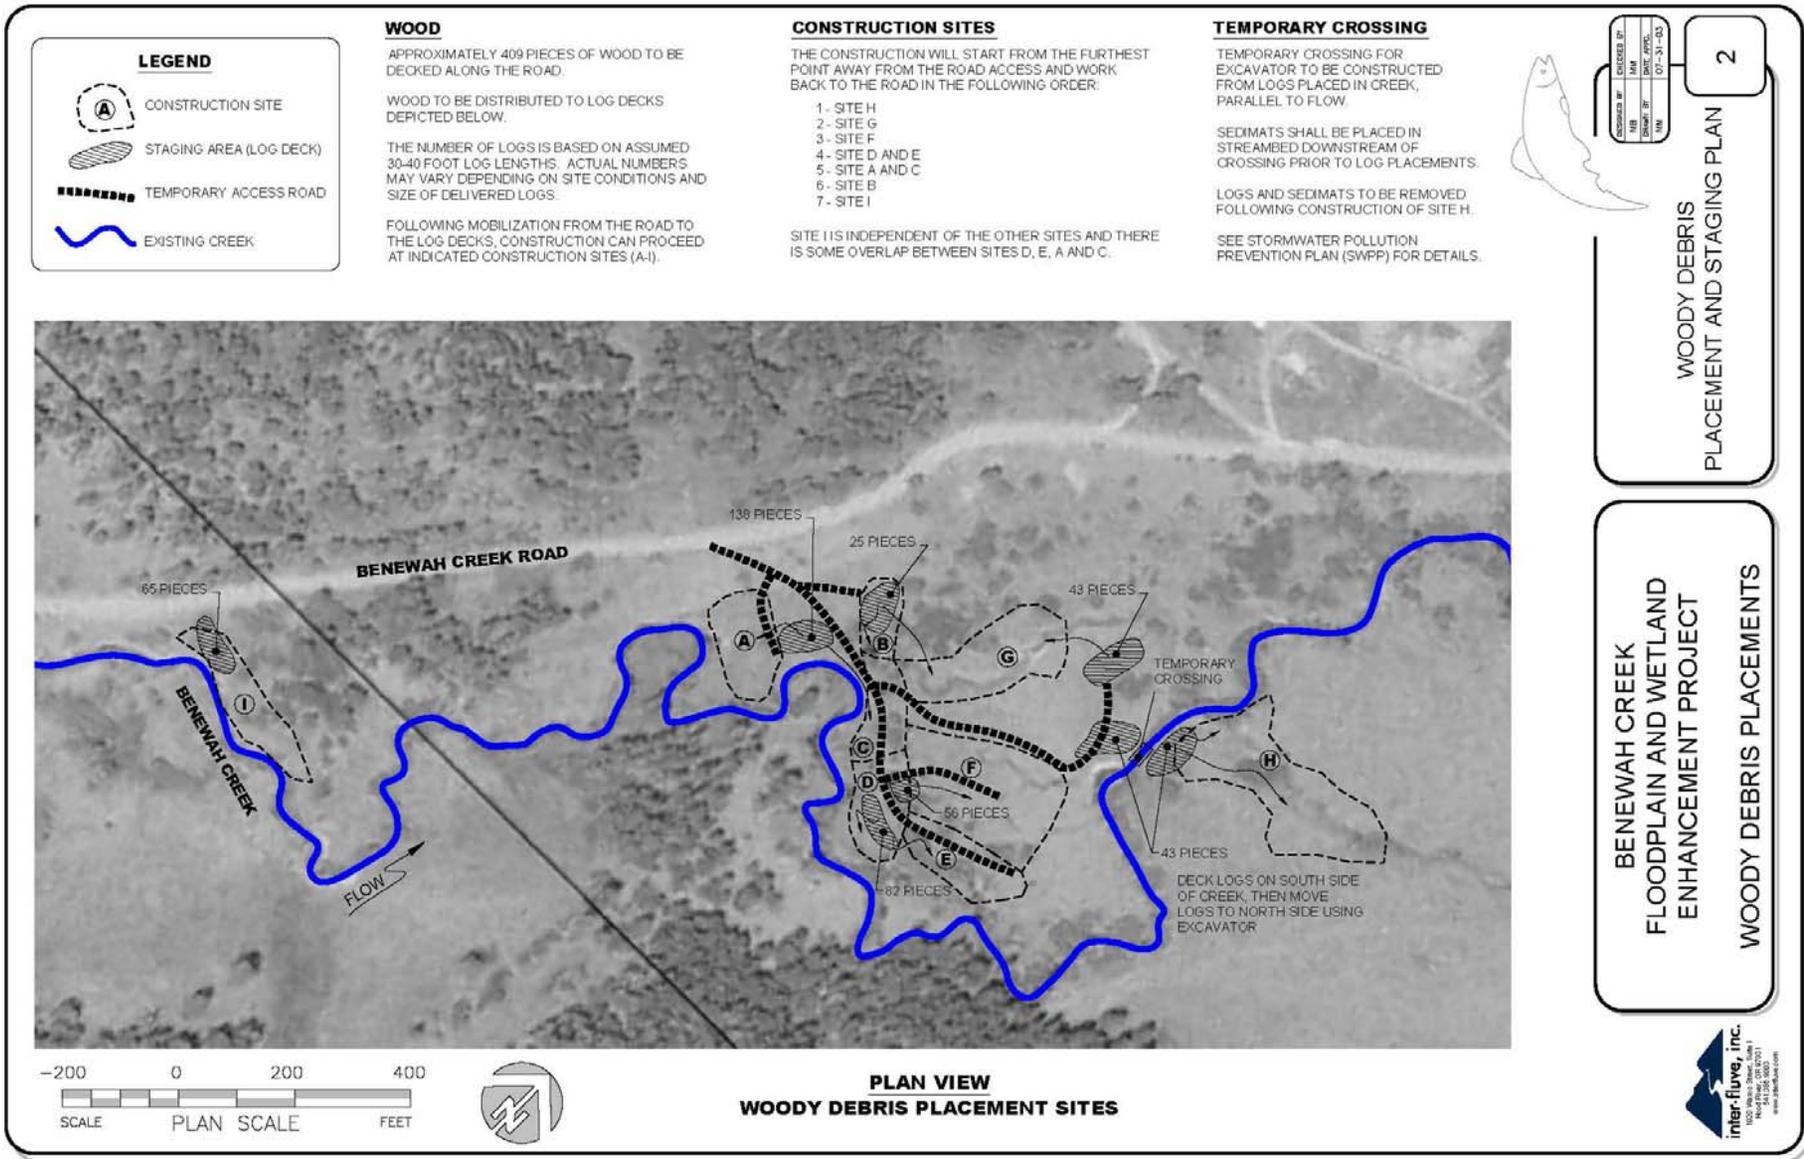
Plan view of floodplain wood placement sites in the Benewah Valley.
